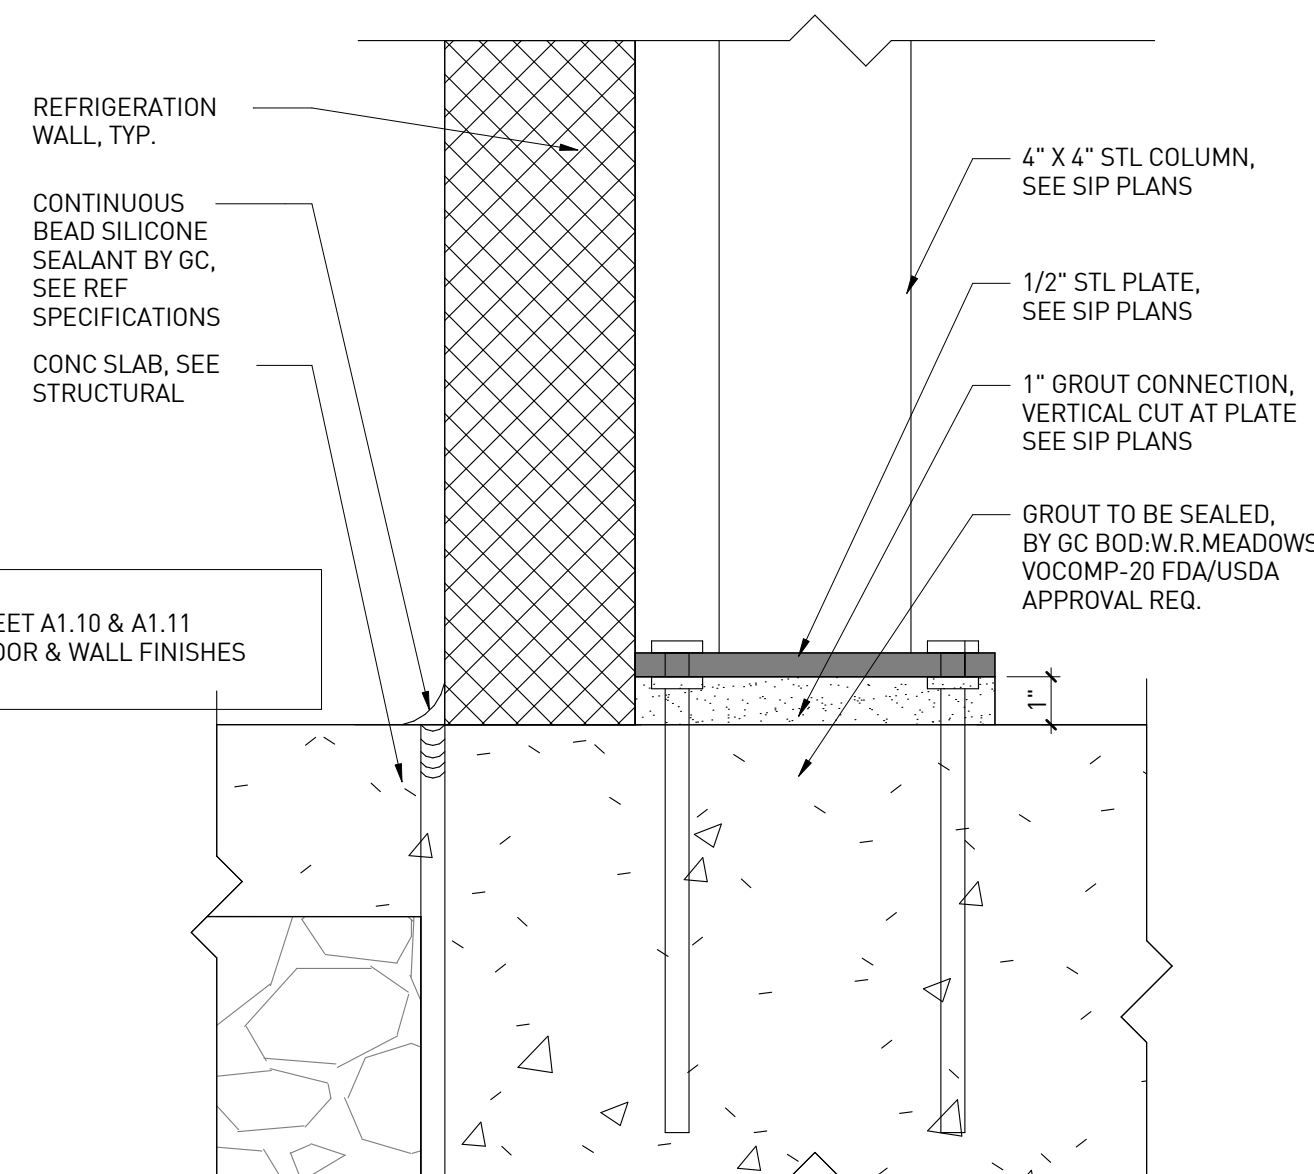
DETAIL AT REFRIGERATION DOOR OPENINGS | 11
